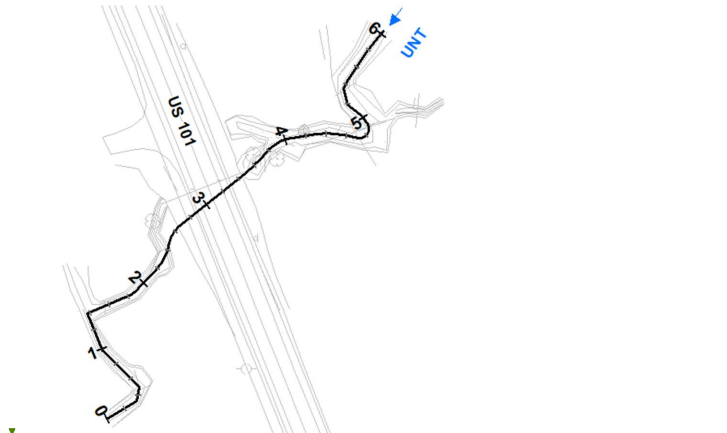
Longitudinal profile stationing for existing, natural, and proposed conditions
